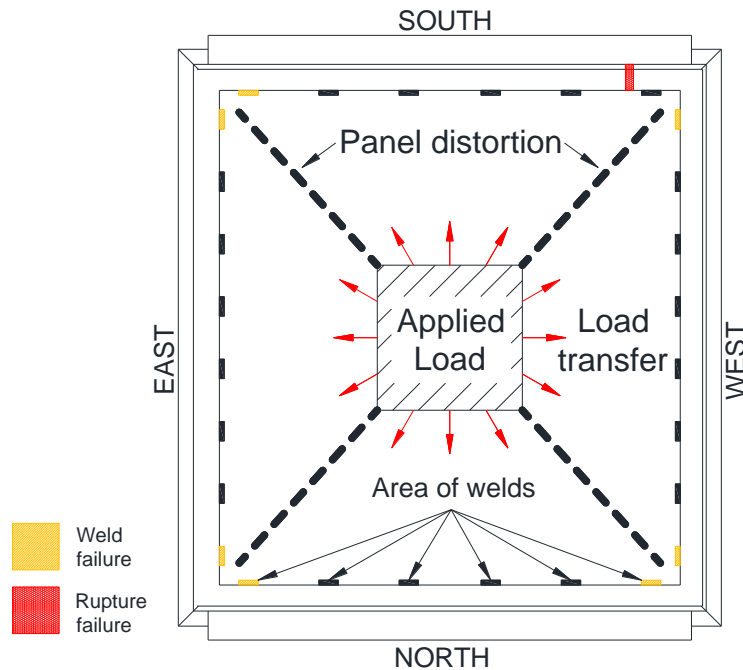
Top view of failure modes in welded DMS.
